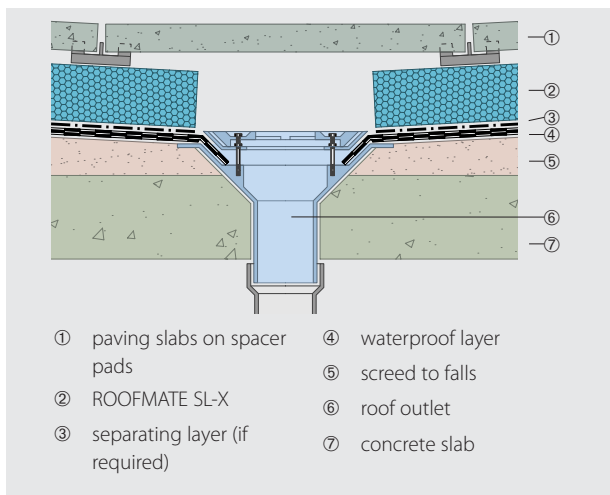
>> Ballasted inverted roof - outlet protected by paving slabs
